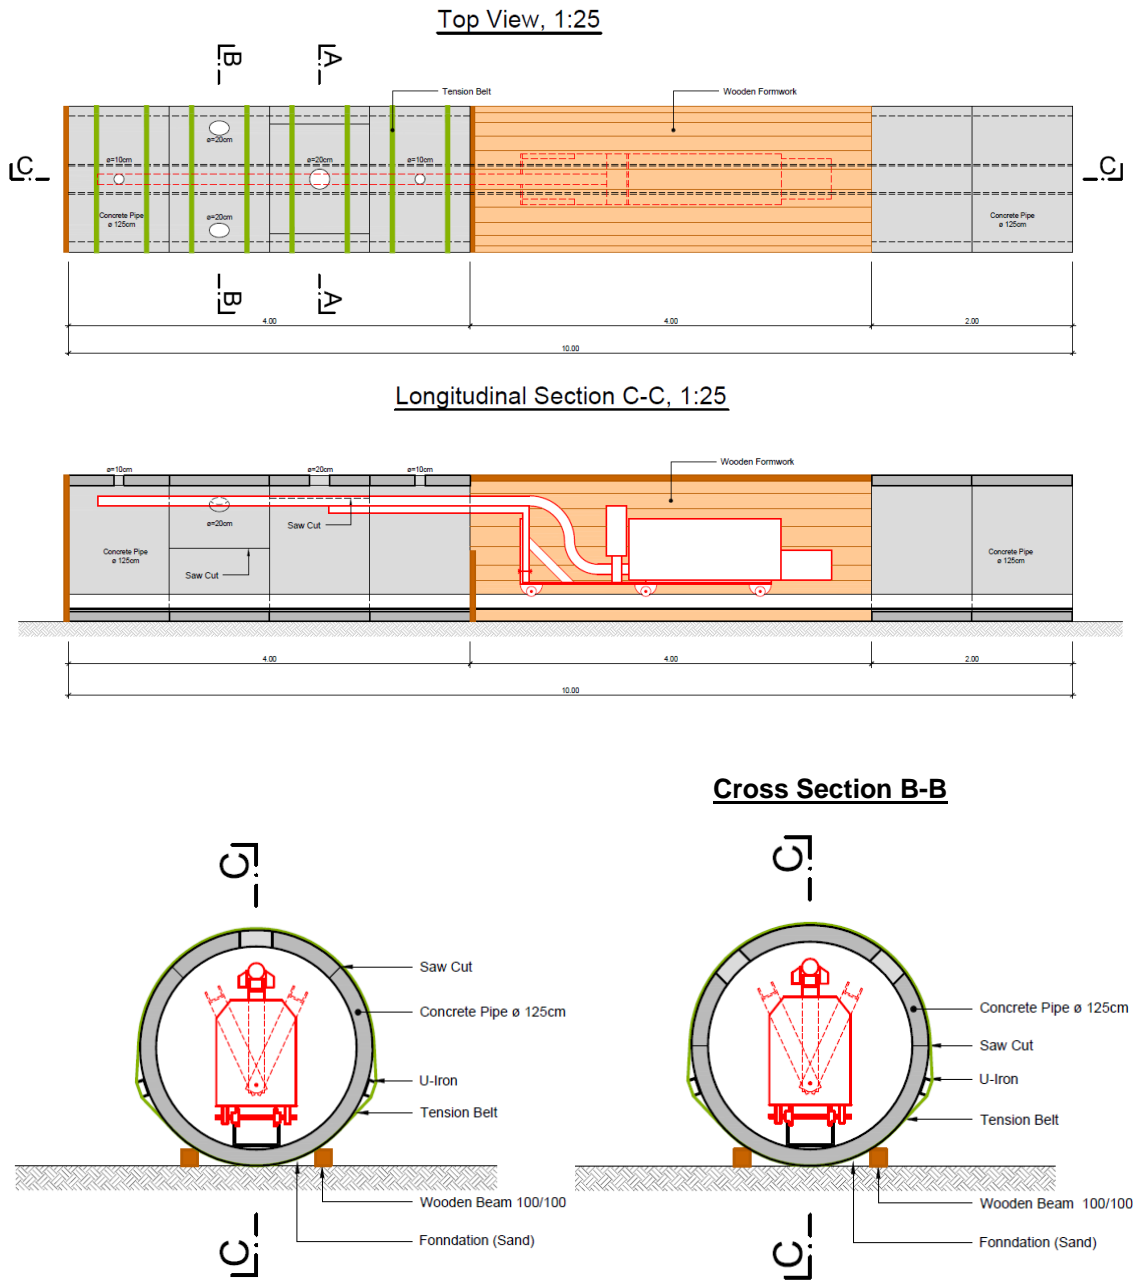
Layout of the emplacement machine and of the pre-test set-up at Hagerbach Test Gallery Ltd.
